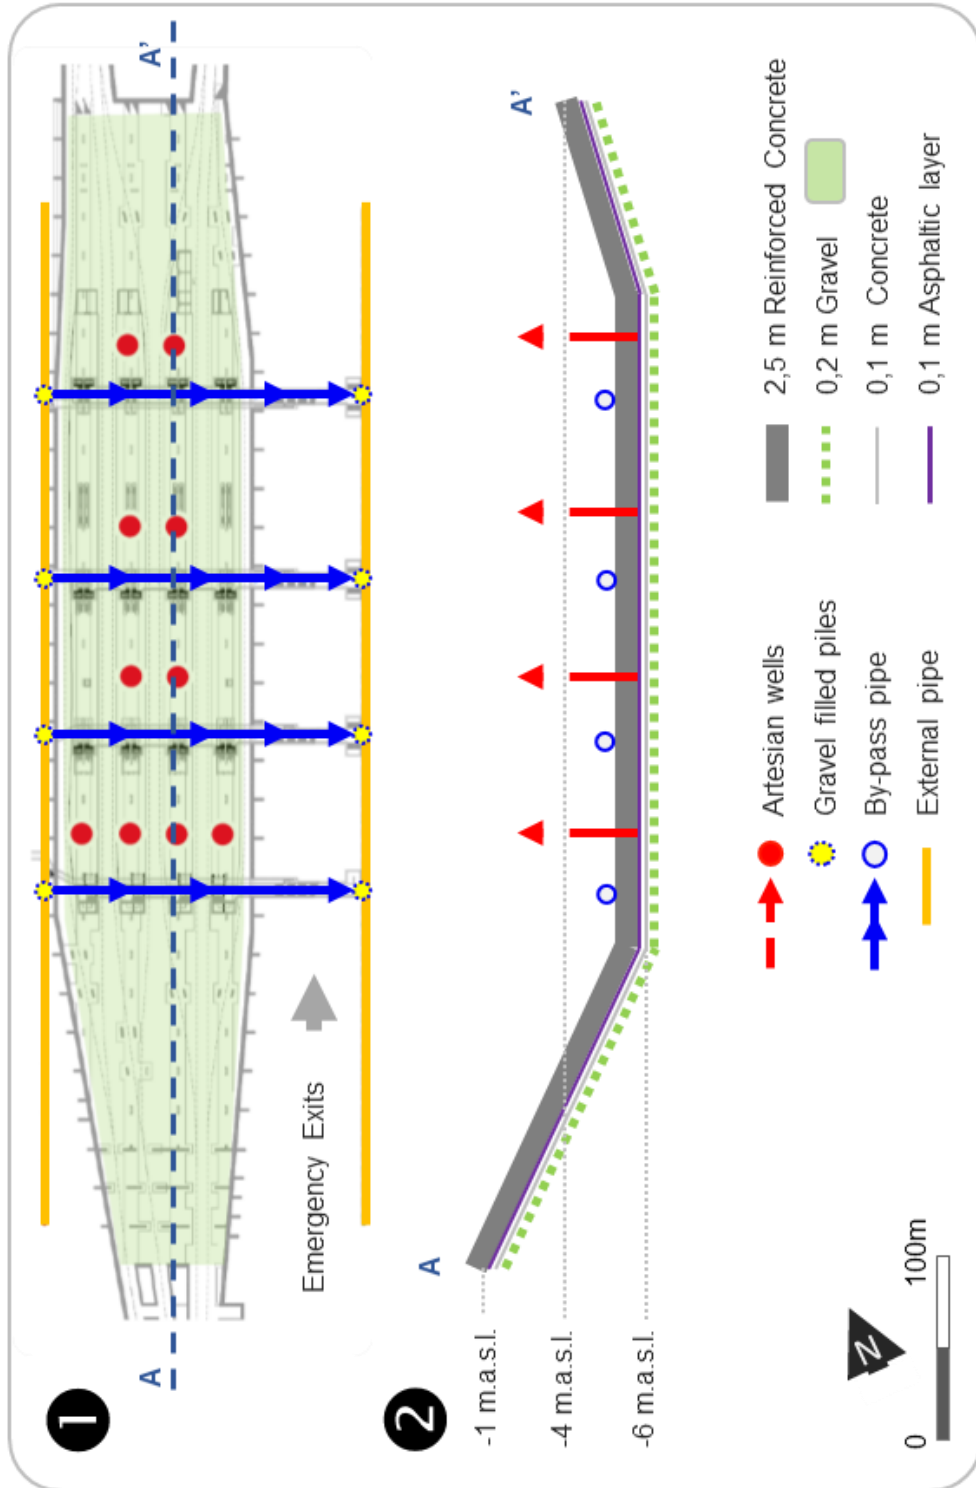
Original design scheme. (1) Plan view. (2) Cross section. Bottom slab
